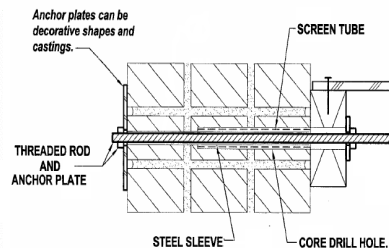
Trough bolt anchor FEMA 547 [4]
